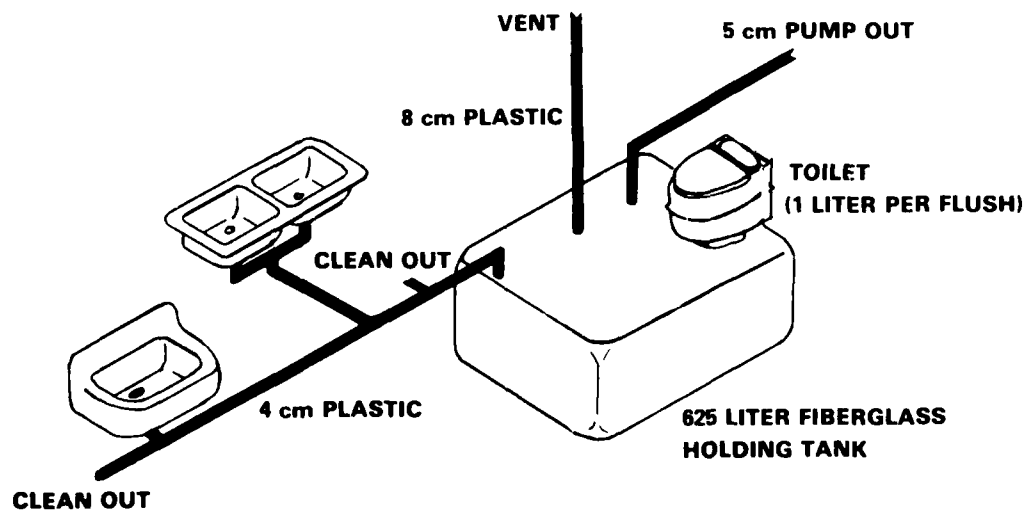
Wastewater plumbing for house on truck-hauled sewage system.
